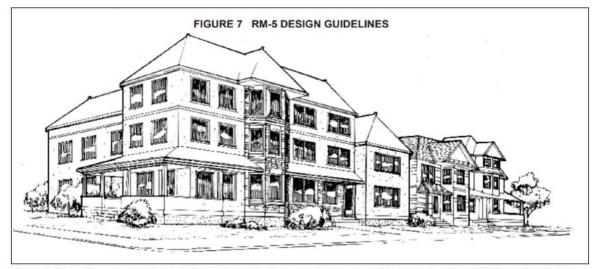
Example of an apartment style building adhering the architectural guidelines outlined in Cliff Bungalow ARP
